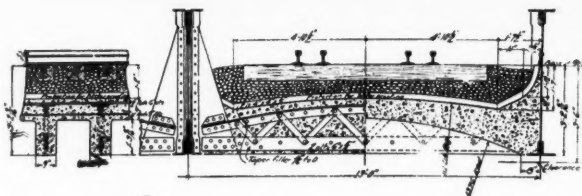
WATERPROOFING BRIDGE FLOORS, N. Y., N. H. & H. R. R.
